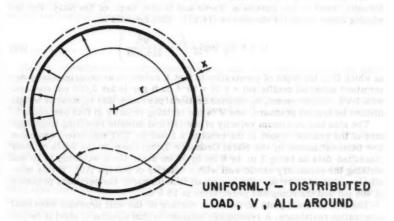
HOOP ACTION OF OPERATING FLOOR REINFORCEMENT
